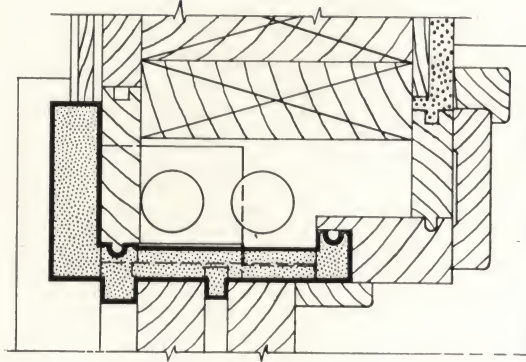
Standard jamb in 6" studding wall with extension jamb and standard trim.
